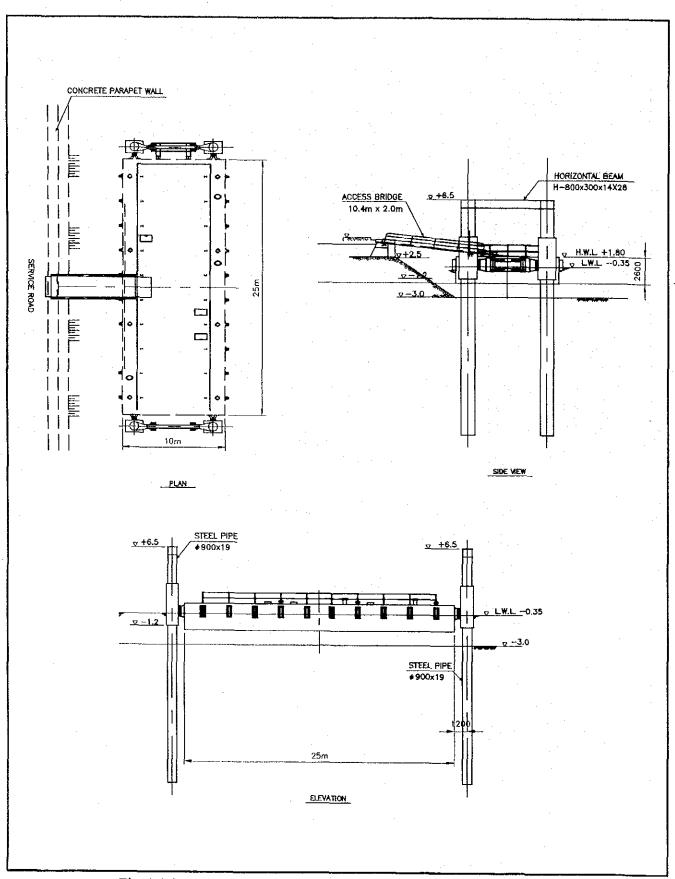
General Plan and Elevations of Small Boat Mooring Area
